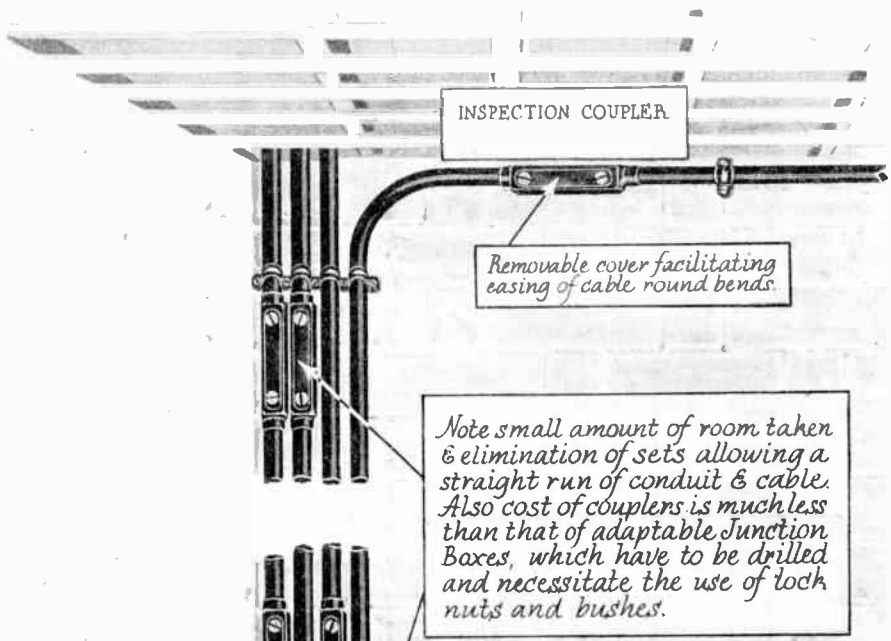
THE LATEST TYPE OF INSPECTION COUPLER.
